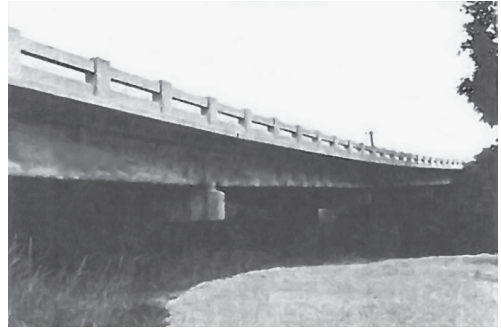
The Boiling Fork Creek Bridge (Burdette & Goodpasture 1974).
